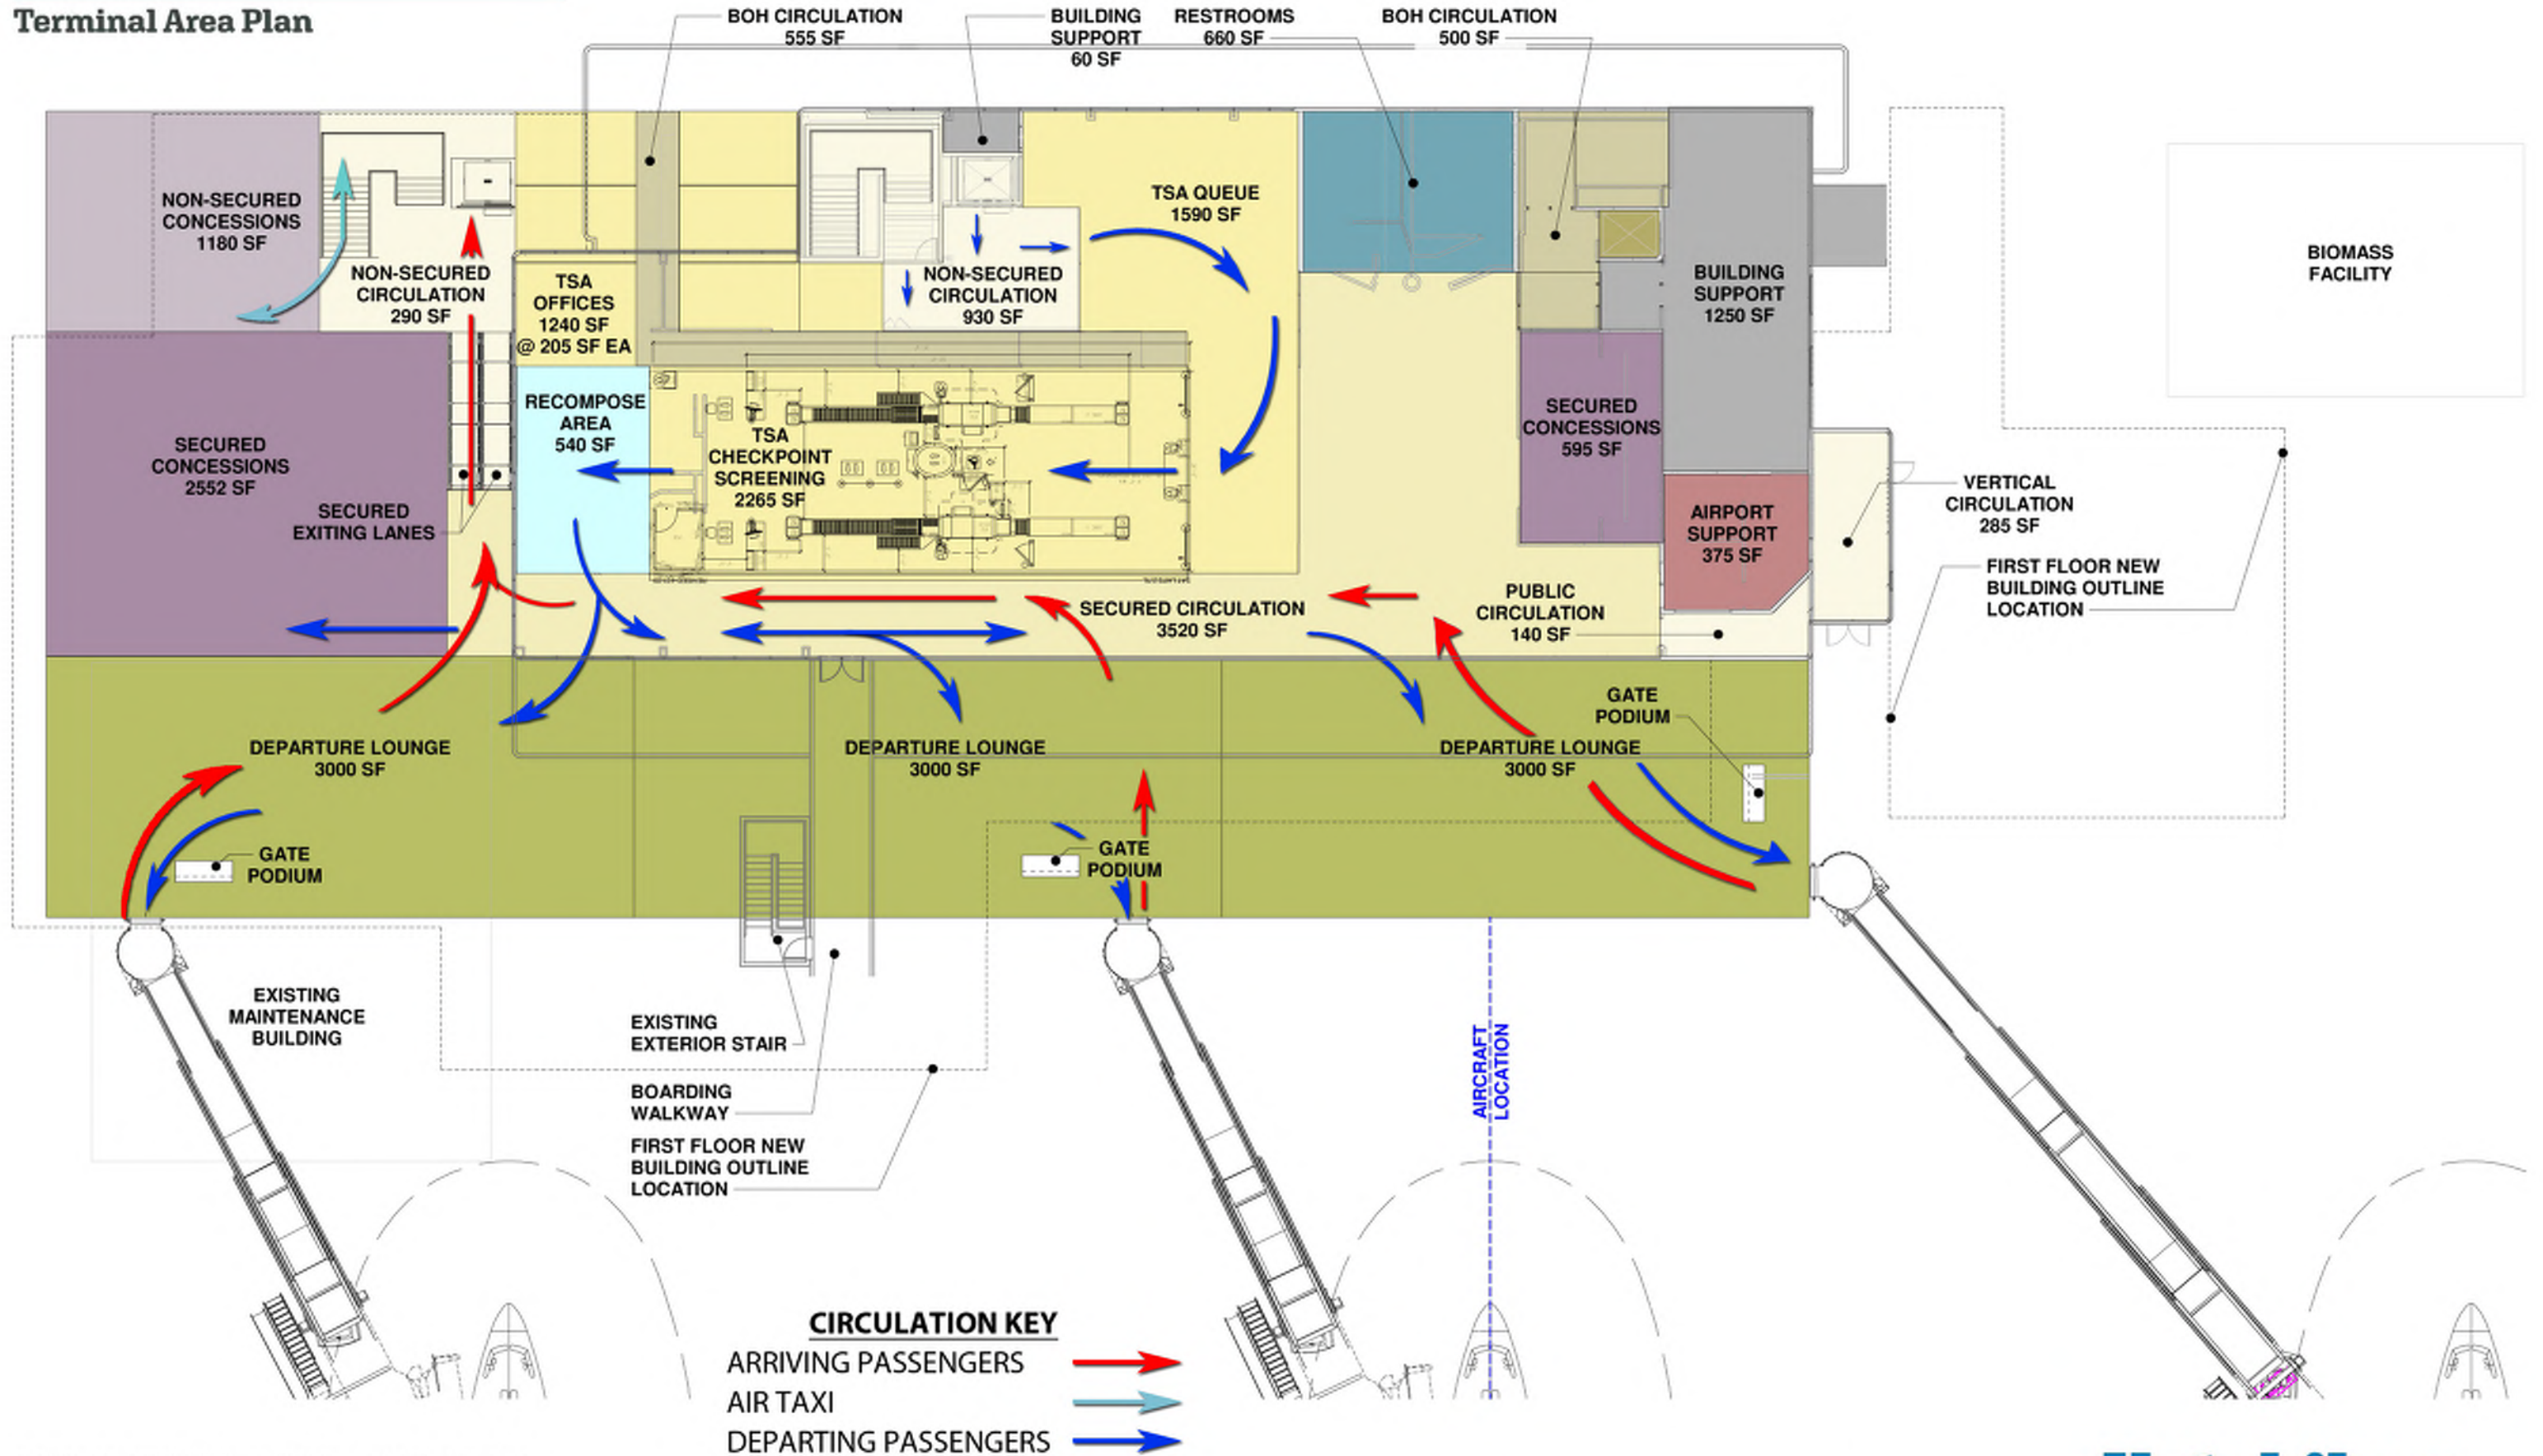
TERMINAL CONCEPT 1, SECOND FLOOR
